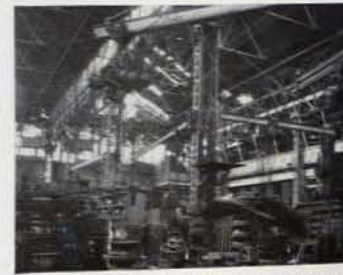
9,700 feet from GZ. Group 50, Building 1. Typical column construction line G, looking northwest.
